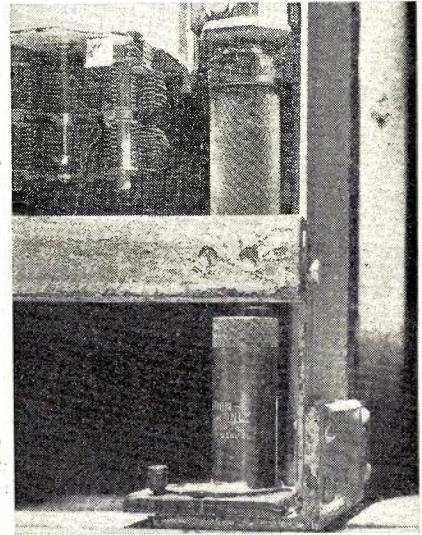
Fastening tool firing steel fixing pins through angle-iron into concrete floor.
